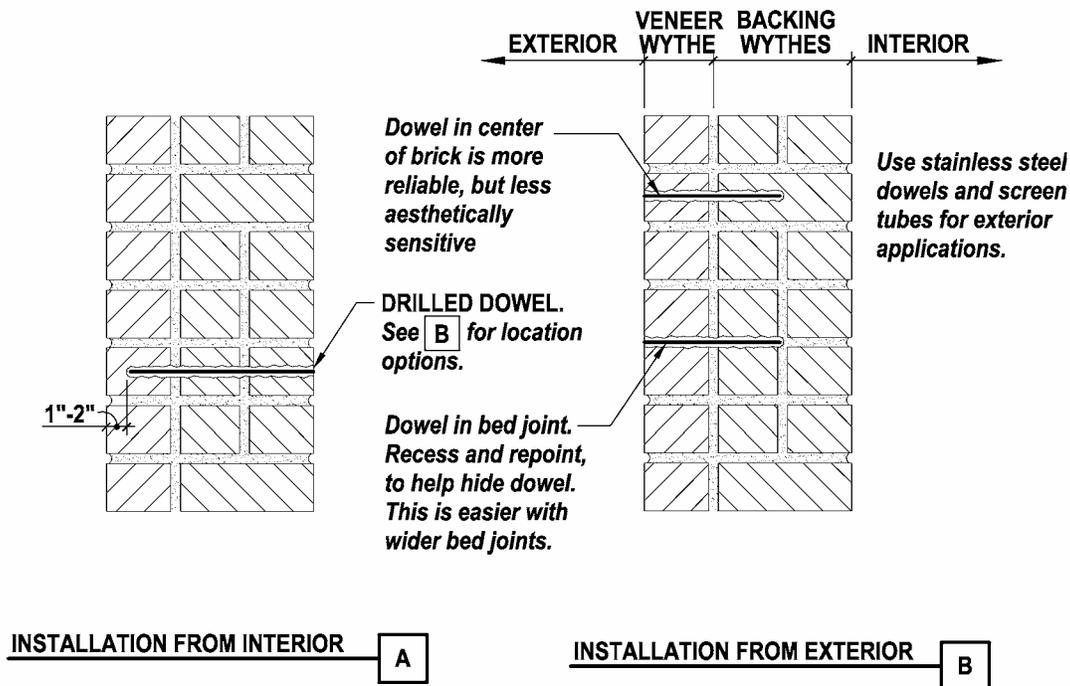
Veneer Ties in Brick Masonry
